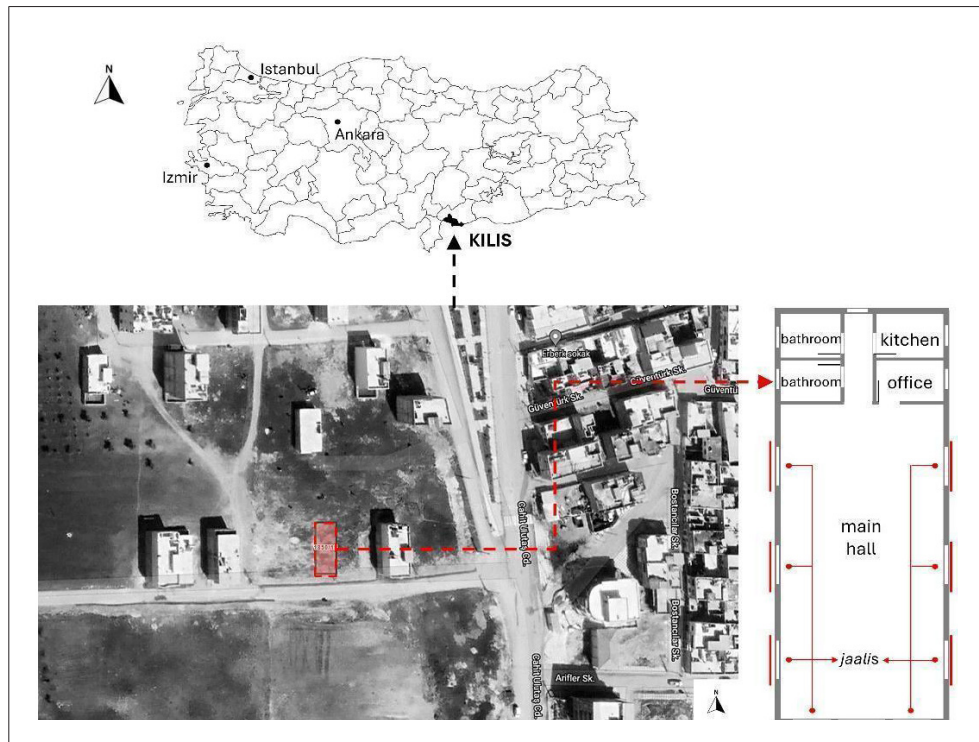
Proposed design of KRCC for the proposed site in Kilis. (Tapu ve Kadastro Genel Müdürlüğü, n.d.).
